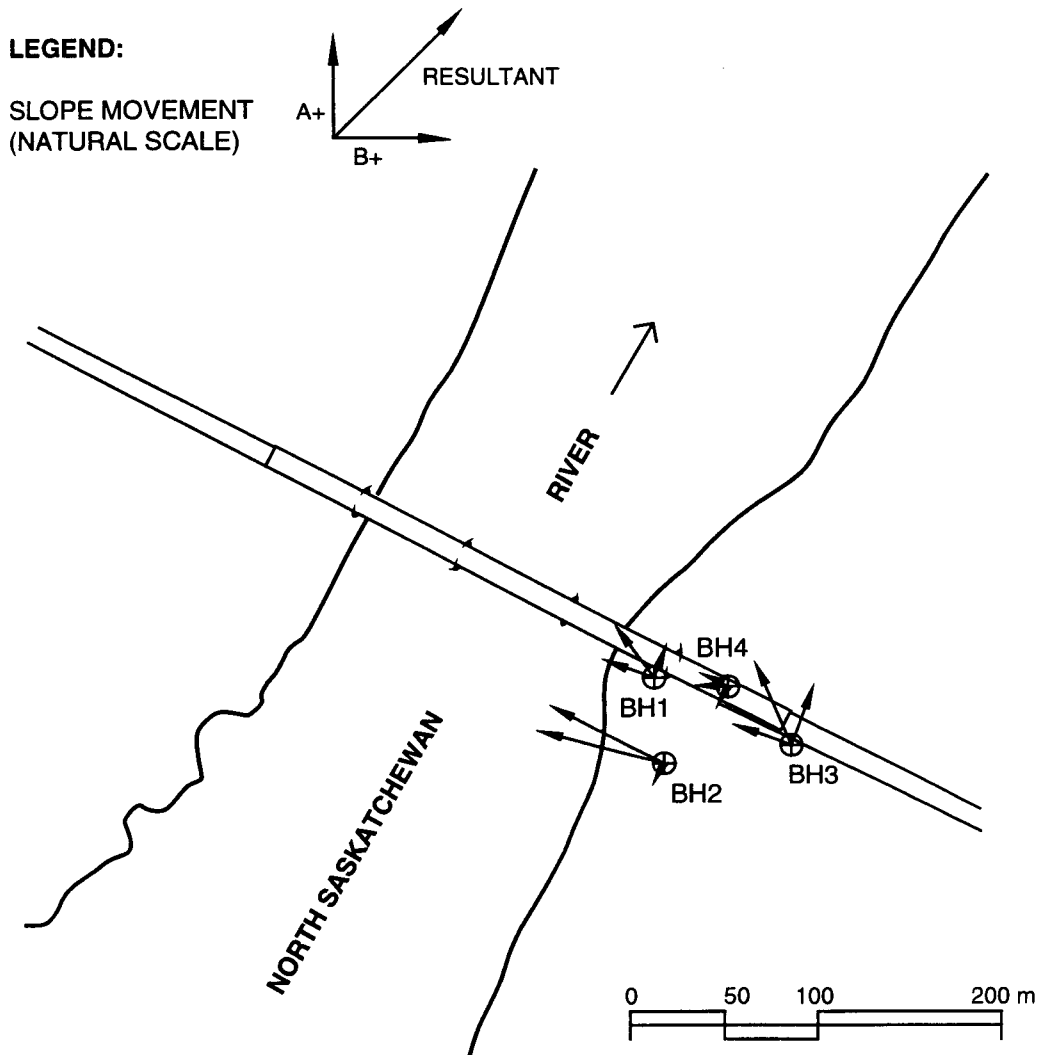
Slope Movement Vectors 1983-1994, South Approach, Borden Bridge
